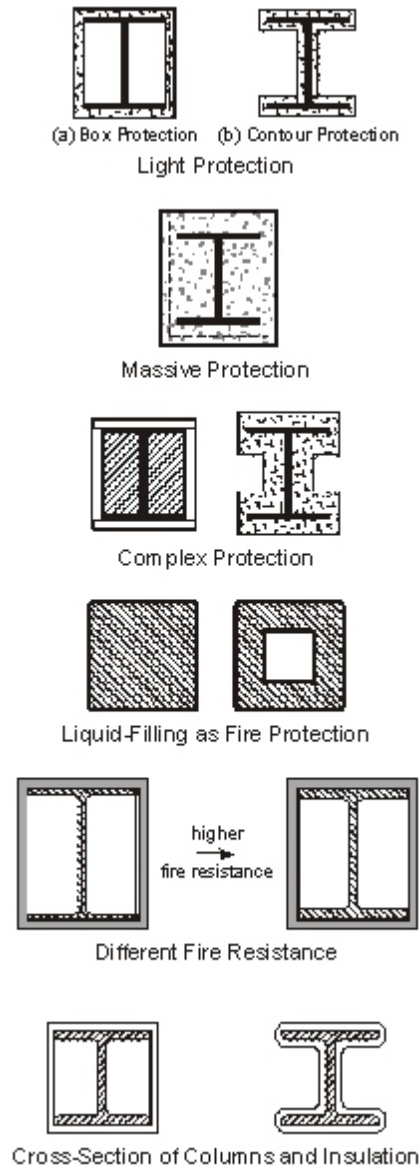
Typical Methods of Protecting Various Structural Steel Elements from Fire
